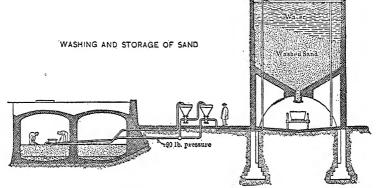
Method of washing and storing sand, Washington filter plant.
